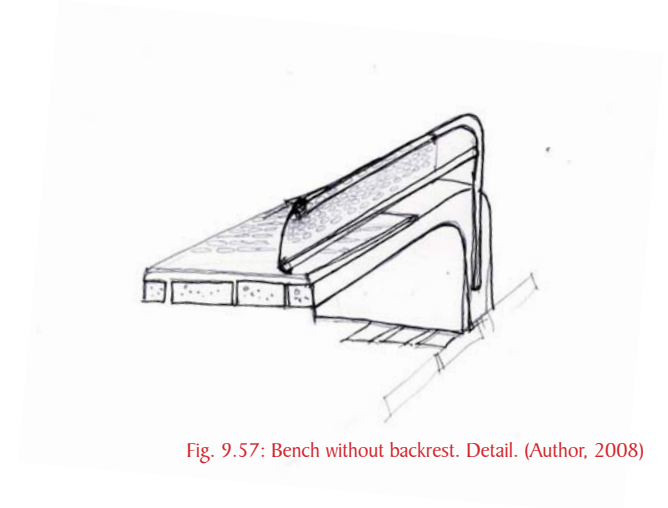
Bench without backrest. Detail. (Author, 2008)
